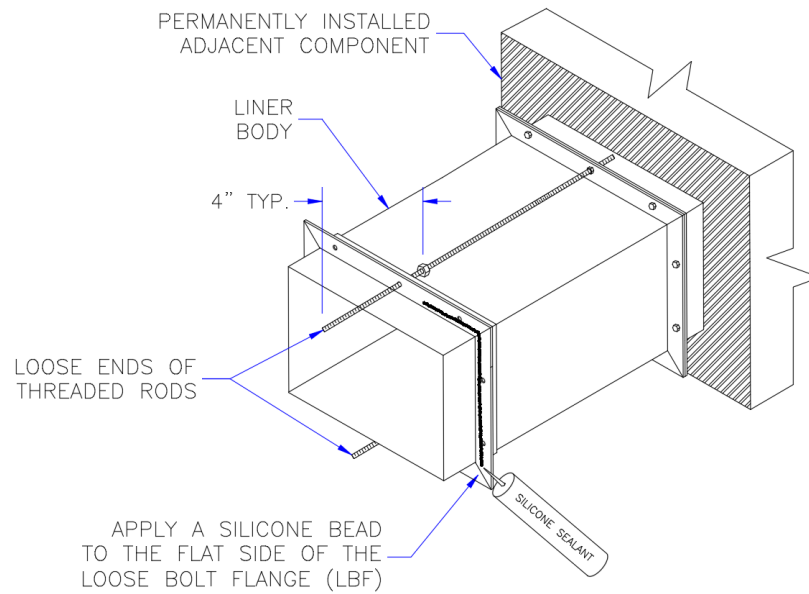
Slide the Loose Bolt Flange over the Liner Body and apply a bead of silicone.
